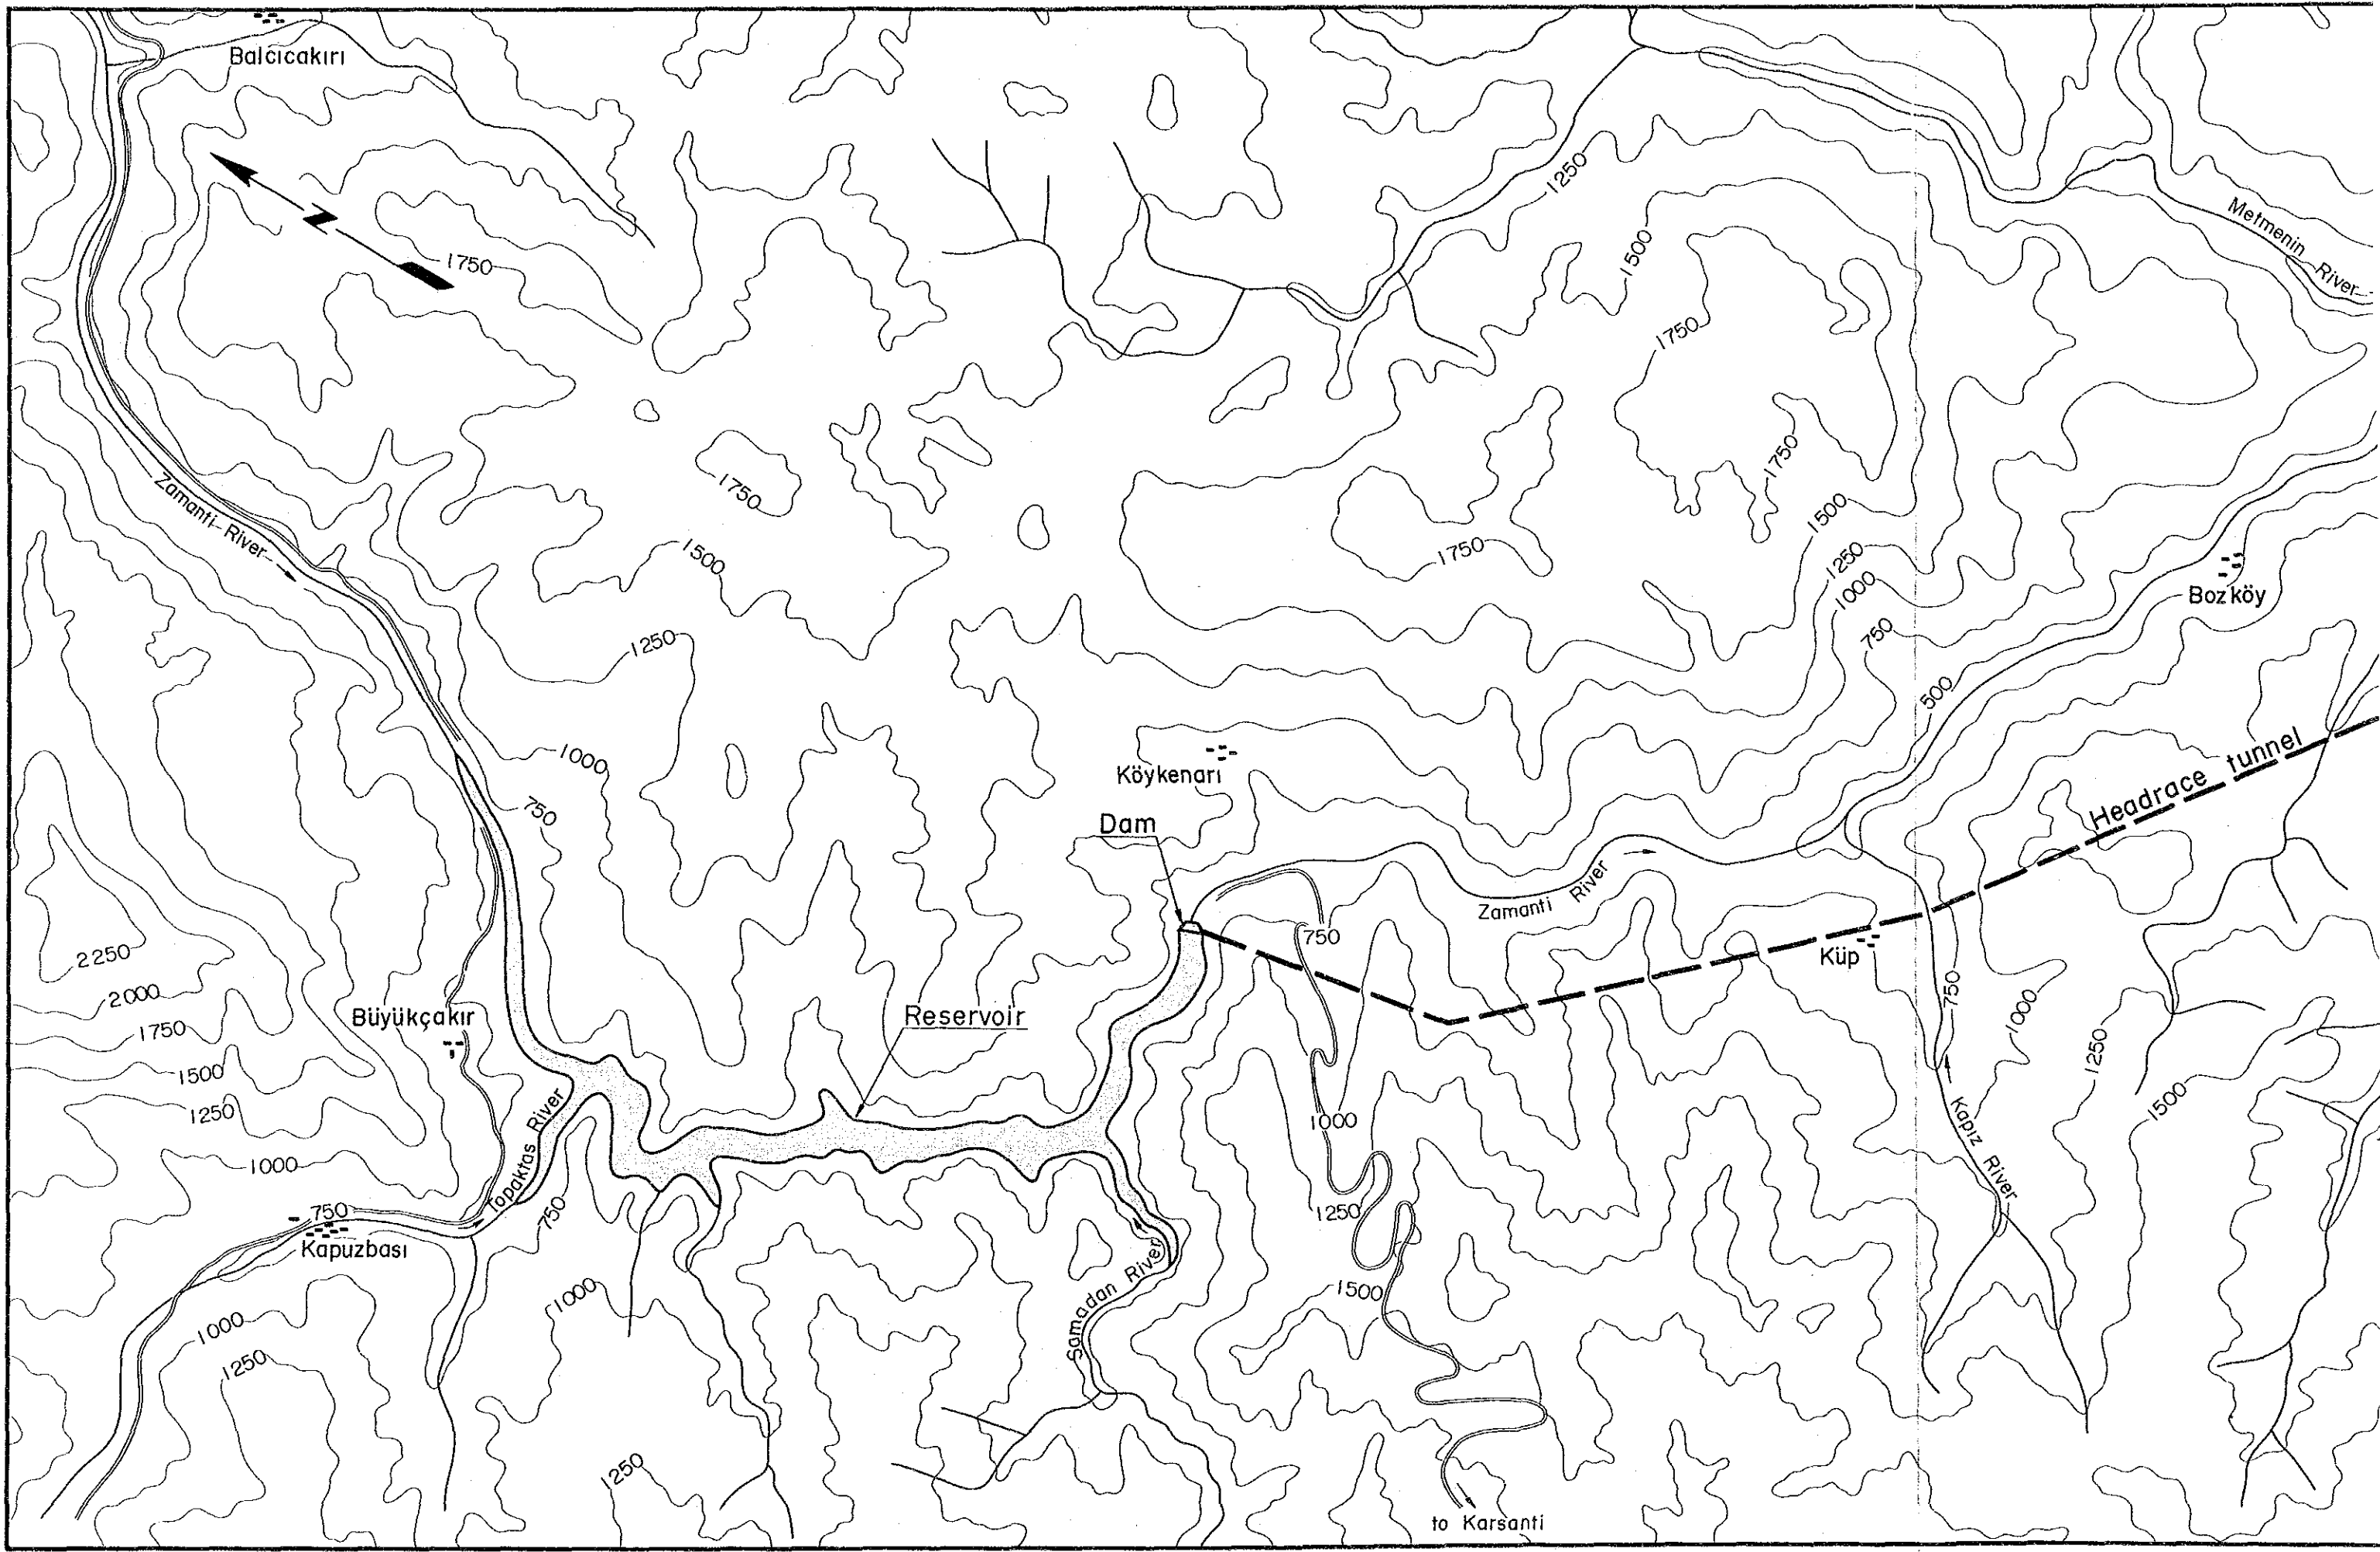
GENERAL PLAN OF THE UPPER SEYHAN MASTER PLAN
